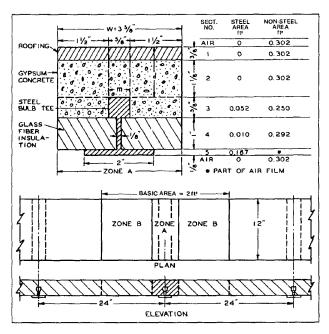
Gypsum Roof Deck on Bulb Tees (Example 4)
